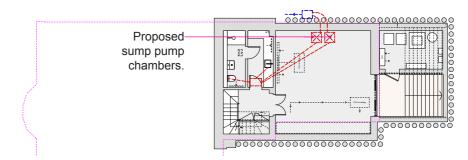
Proposed lower ground floor plan with proposed drainage shown in dashed red line.
